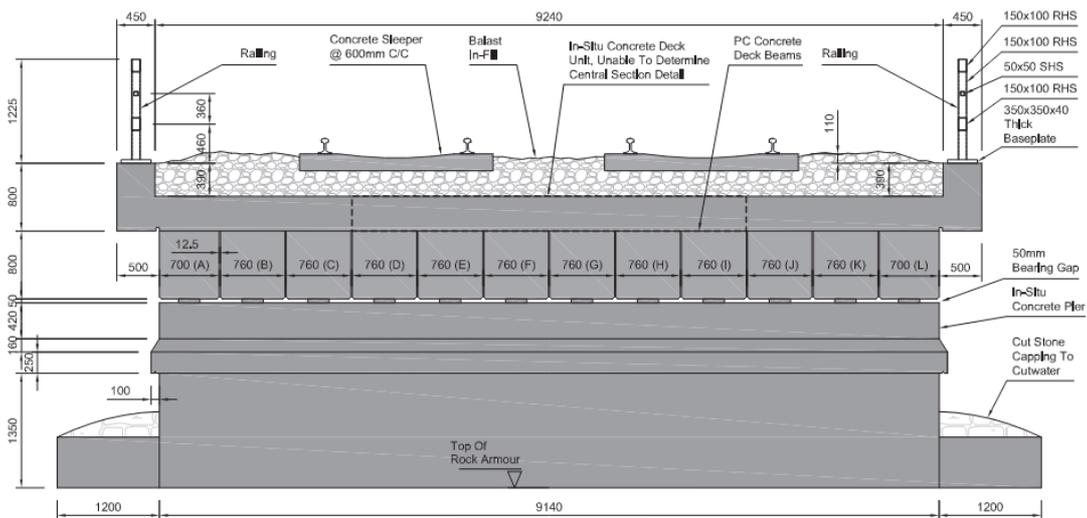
UBB30 Typical section for spans 4 and 5 (spans replaced following collapse)
